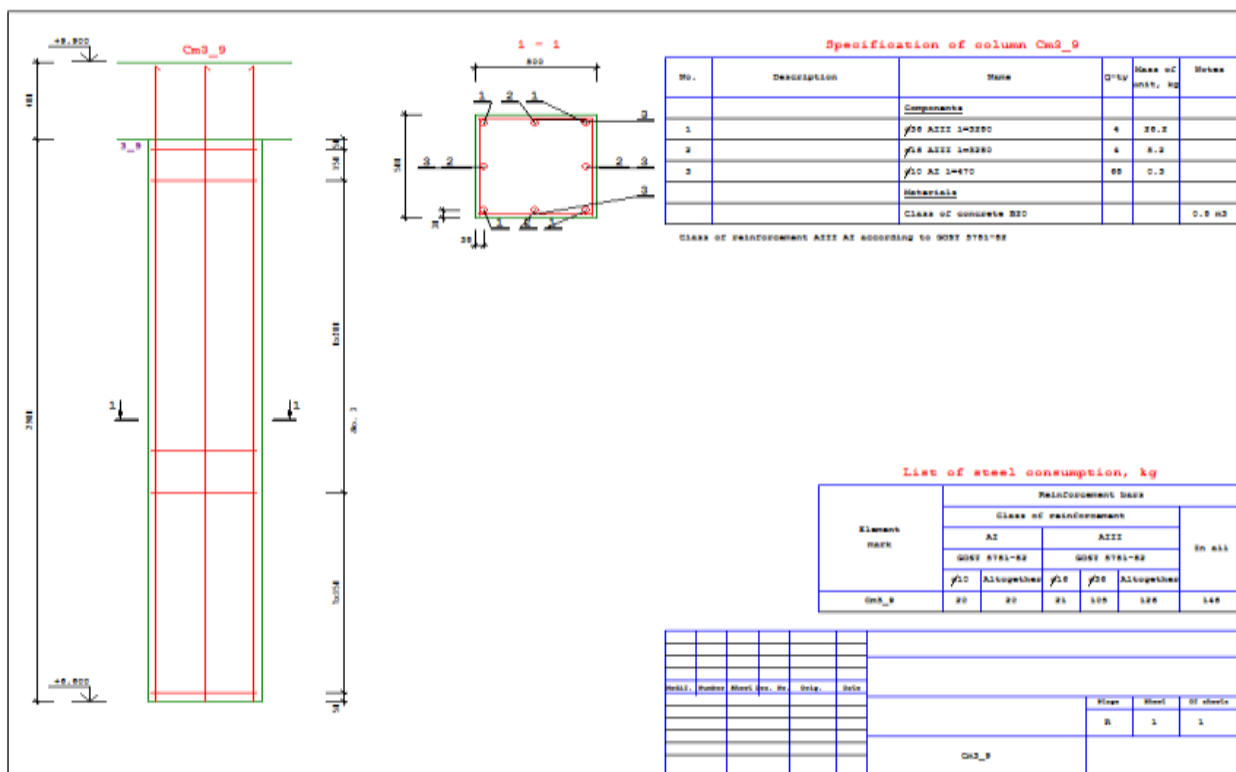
Variant of a building with slab floors. Column K3-9. Working project drawings
